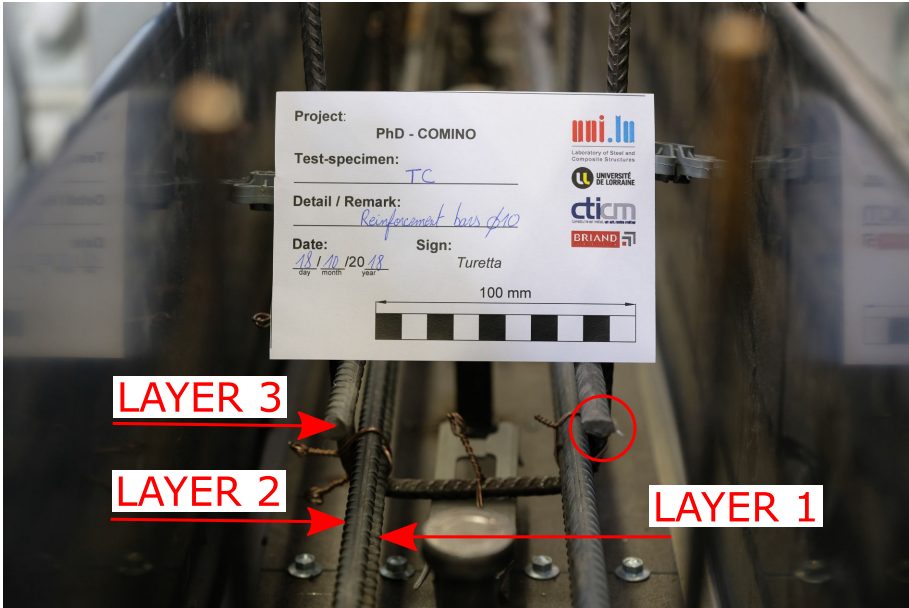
Longitudinal rebars at the bottom of the section (HA10)
